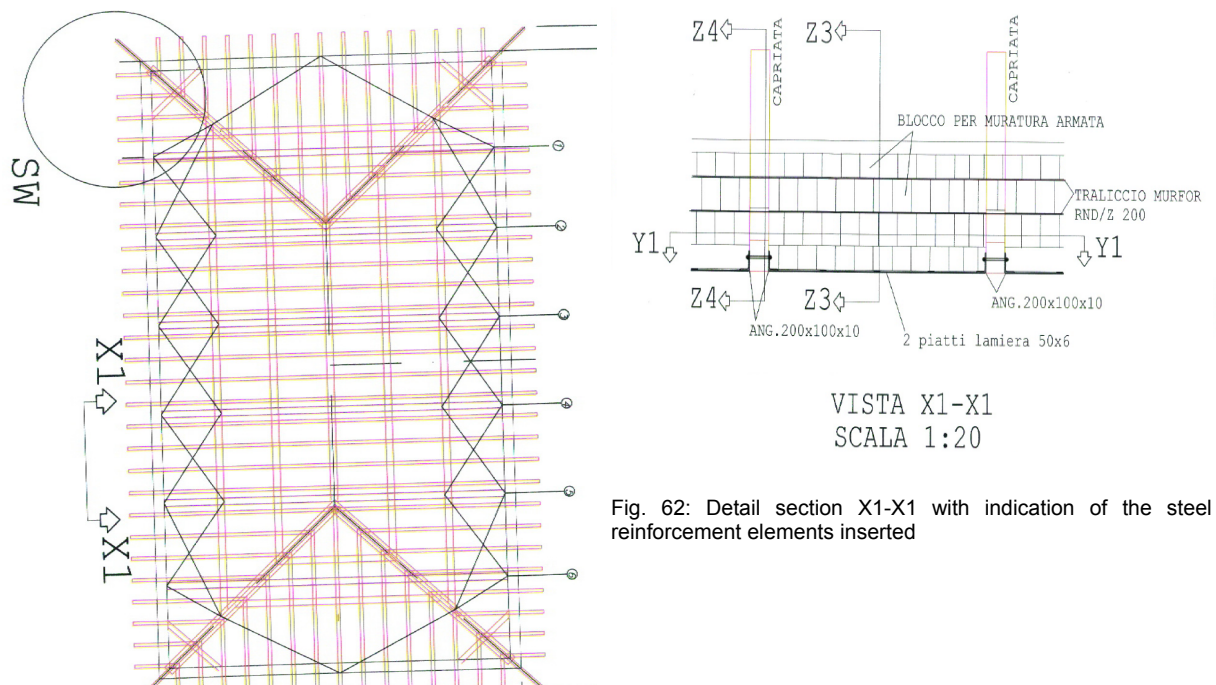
Scheme plan of the refurbished roof with indication of the perimeter masonry walls and of the steel reinforcement elements inserted
